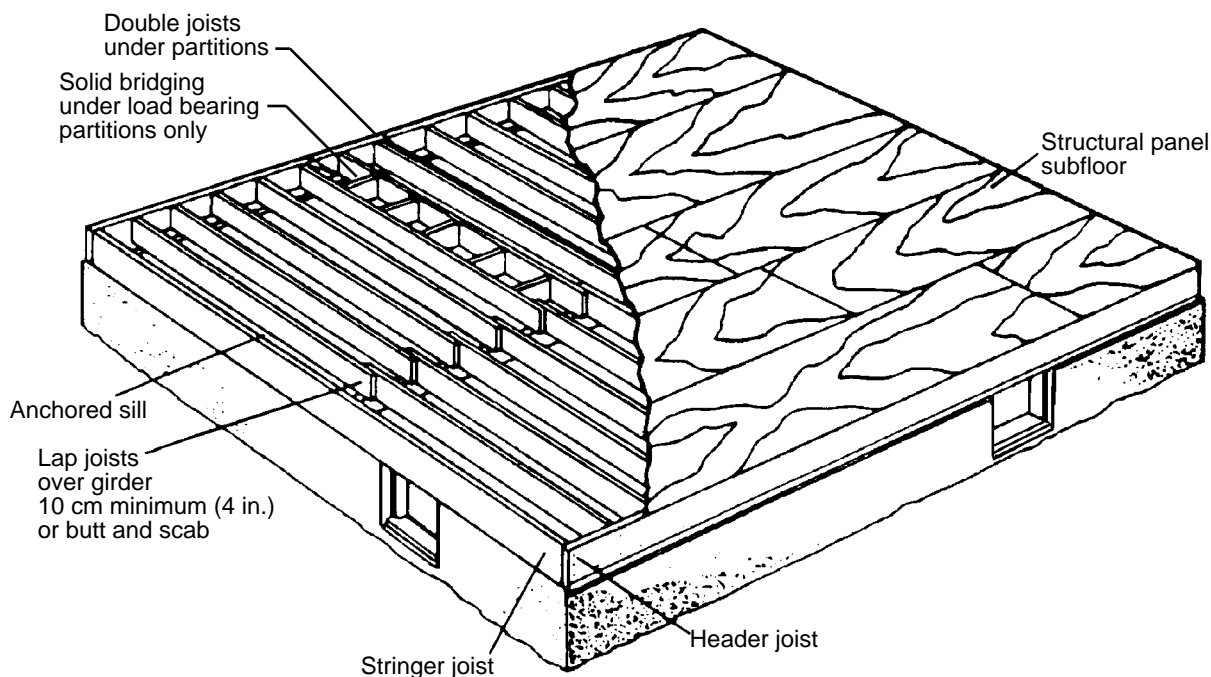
Typical floor details for platform construction with joists spliced on center beam.
